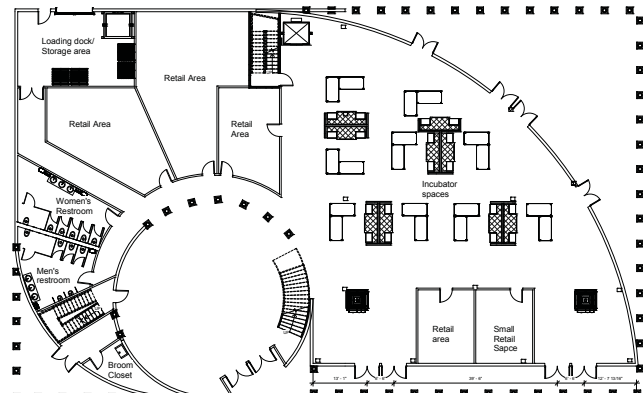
Building design, floorplan, and furniture layout by Valerie Jenkins.
